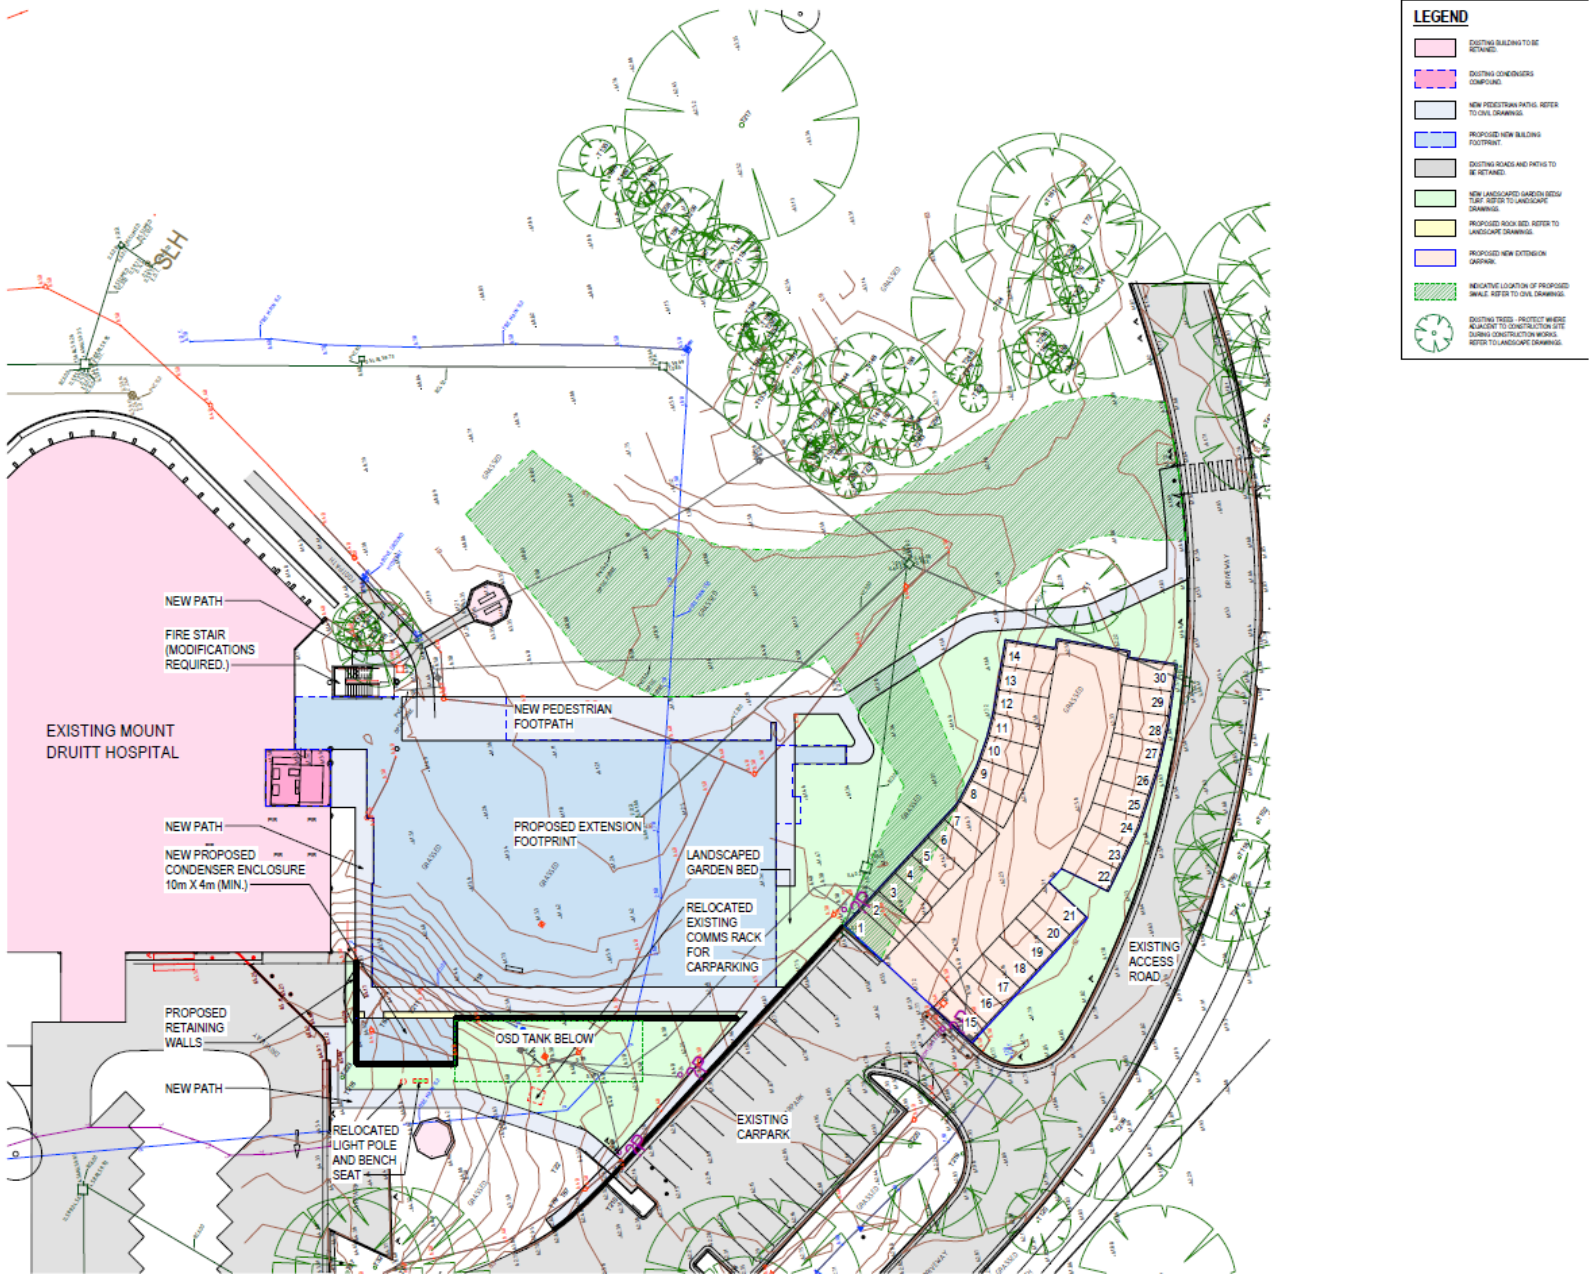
Site layout of Mount Druitt Hospital (Source: Jacobs, 2025)
